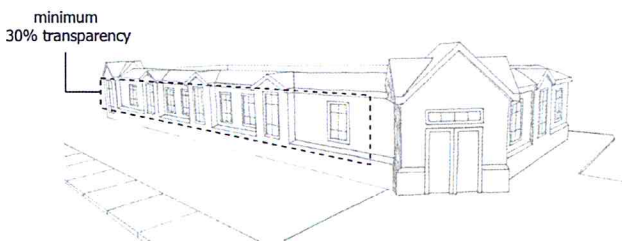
(Transparency): Single story structures, as shown above must provide at least 30% transparency in the area between two and ten feet above the adjacent sidewalk or ground (For a multi-story example see Figure 8).
